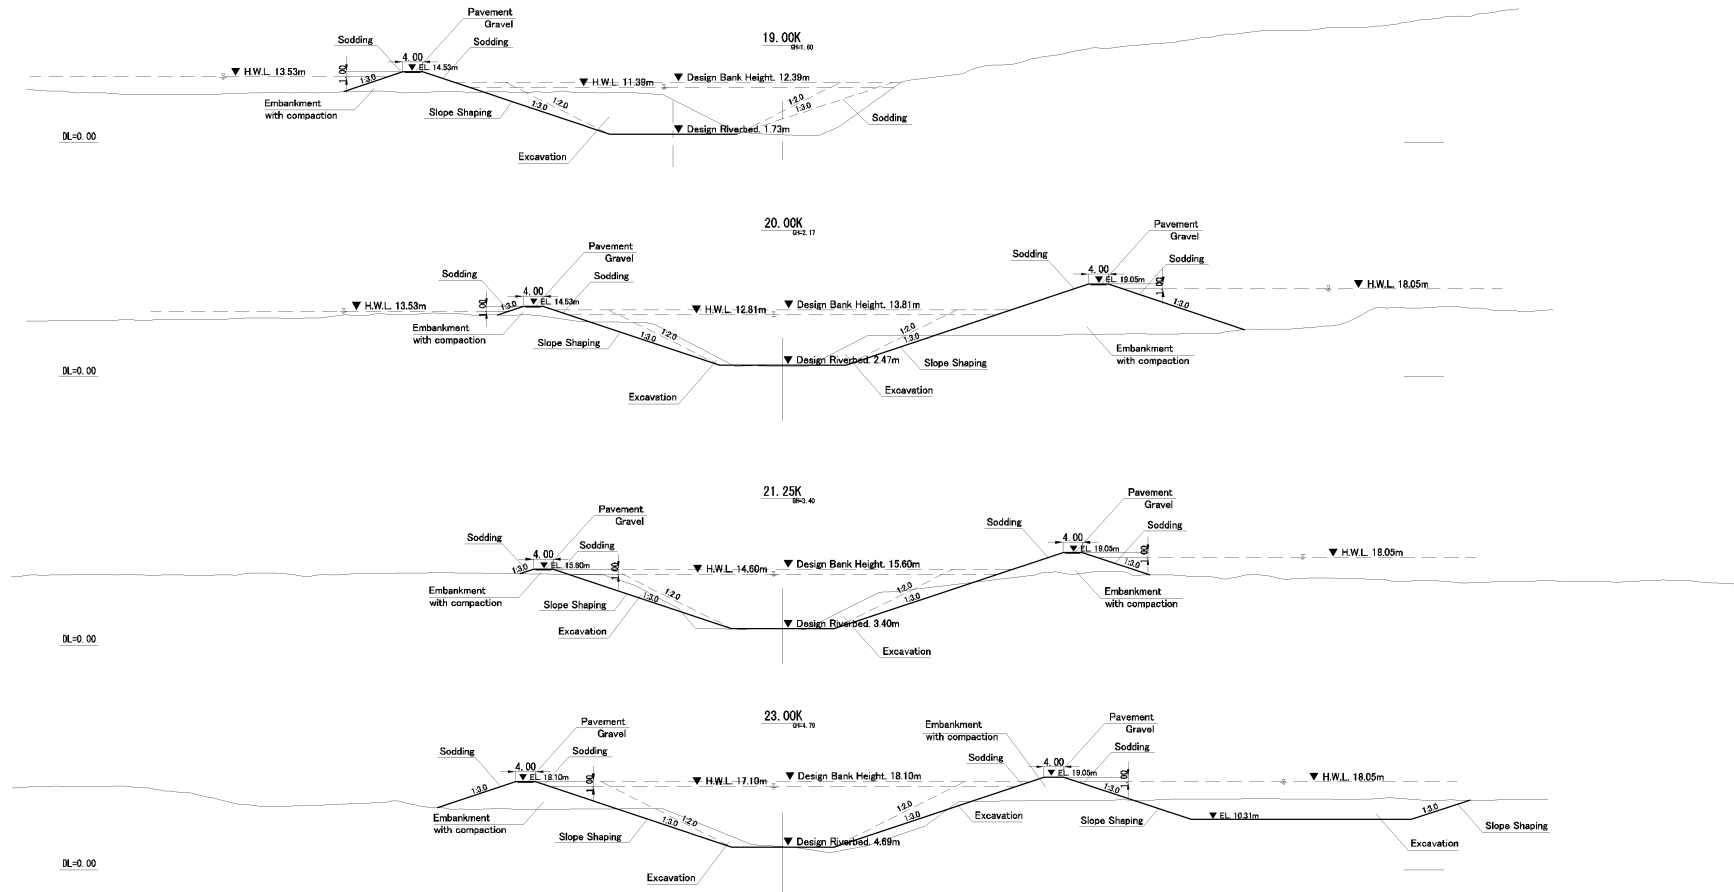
Typical Cross Section (Retarding Basin A, B)
